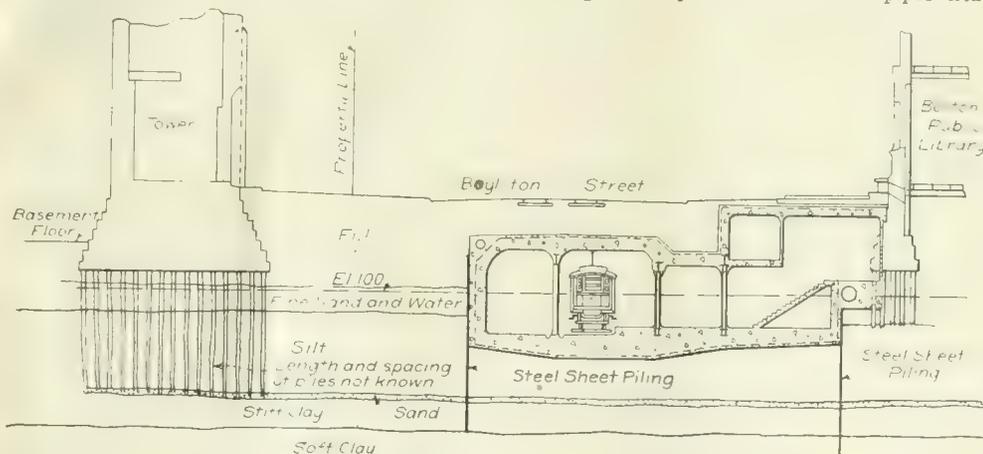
Cross Section Showing Soft Foundation of Tower of Old South Church, Boston, Mass., Adjacent Subway and Character of Subsoil at Site.
